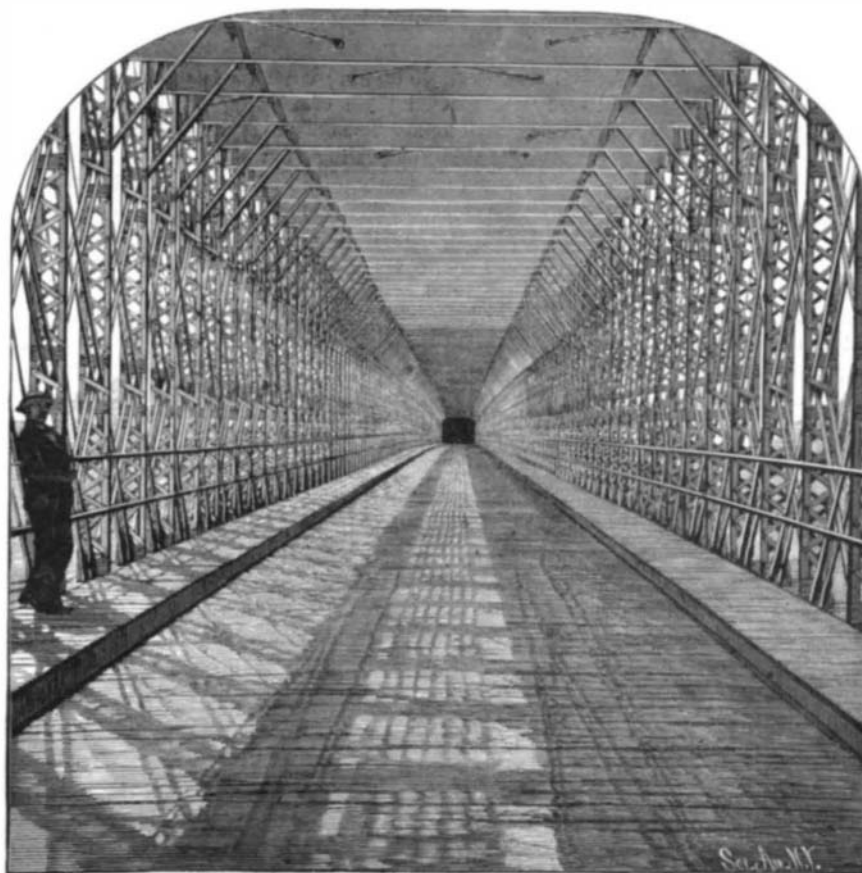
CARRIAGE WAY, SHOWING TRUSSES.
